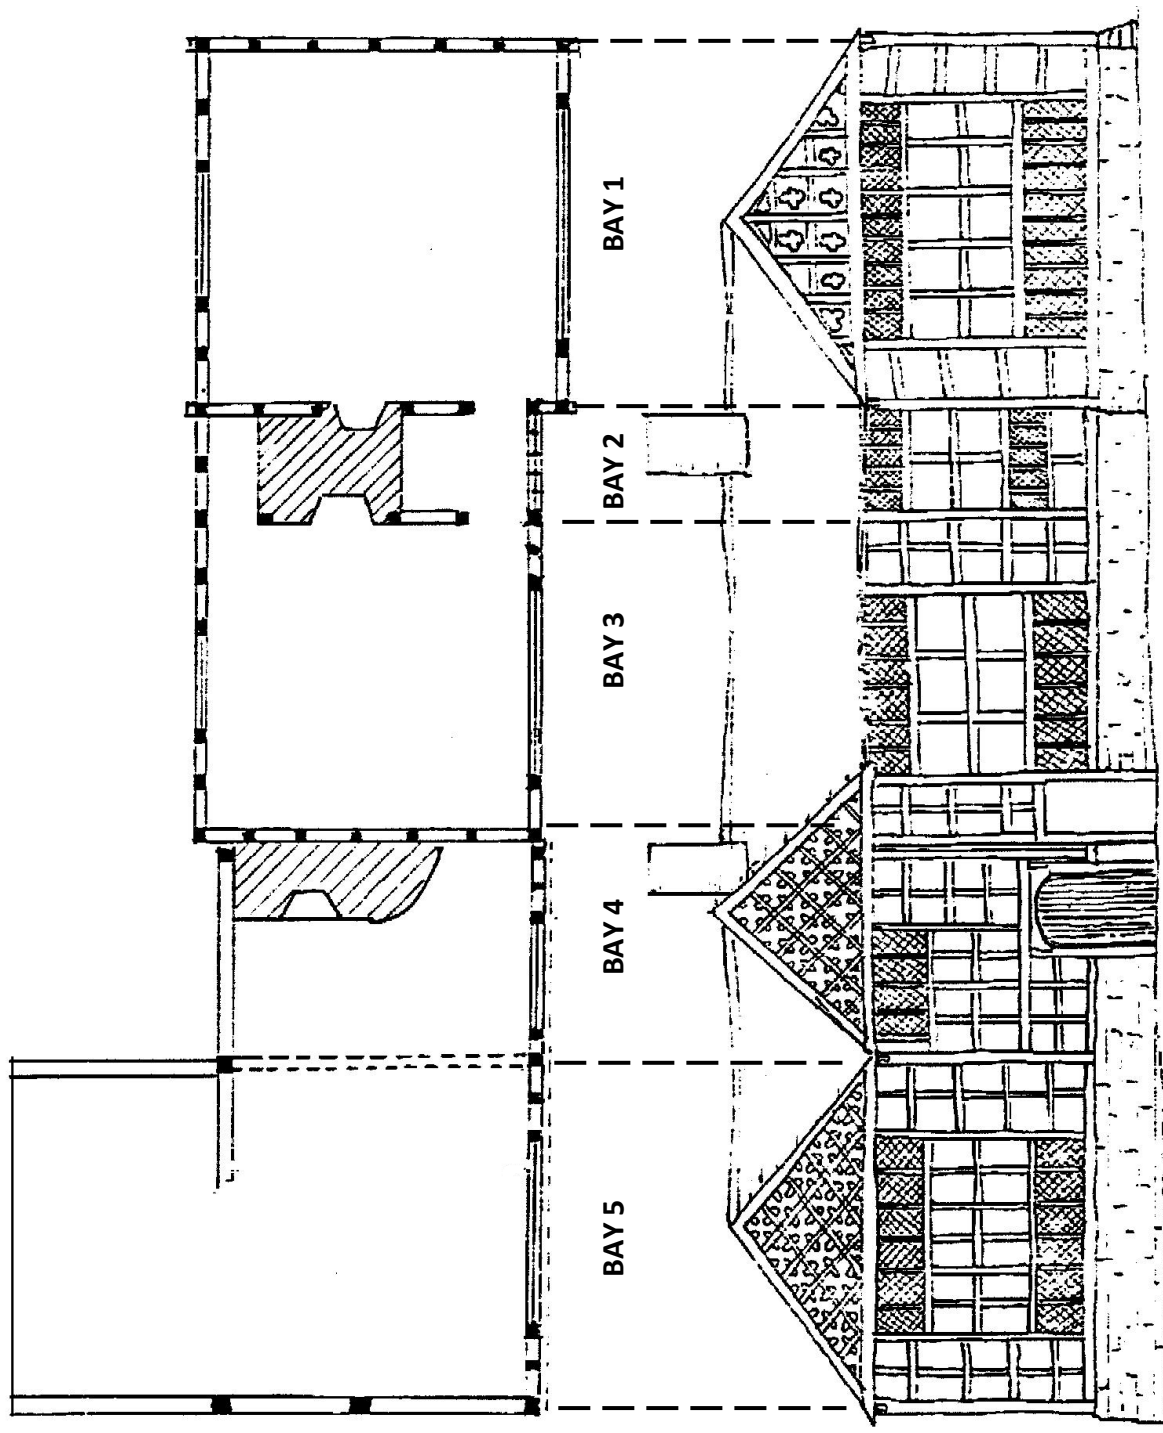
Plan (at first floor level) and front elevation of the Olde Boar's Head to show the layout and arrangement of the bays (after W J Smith)
